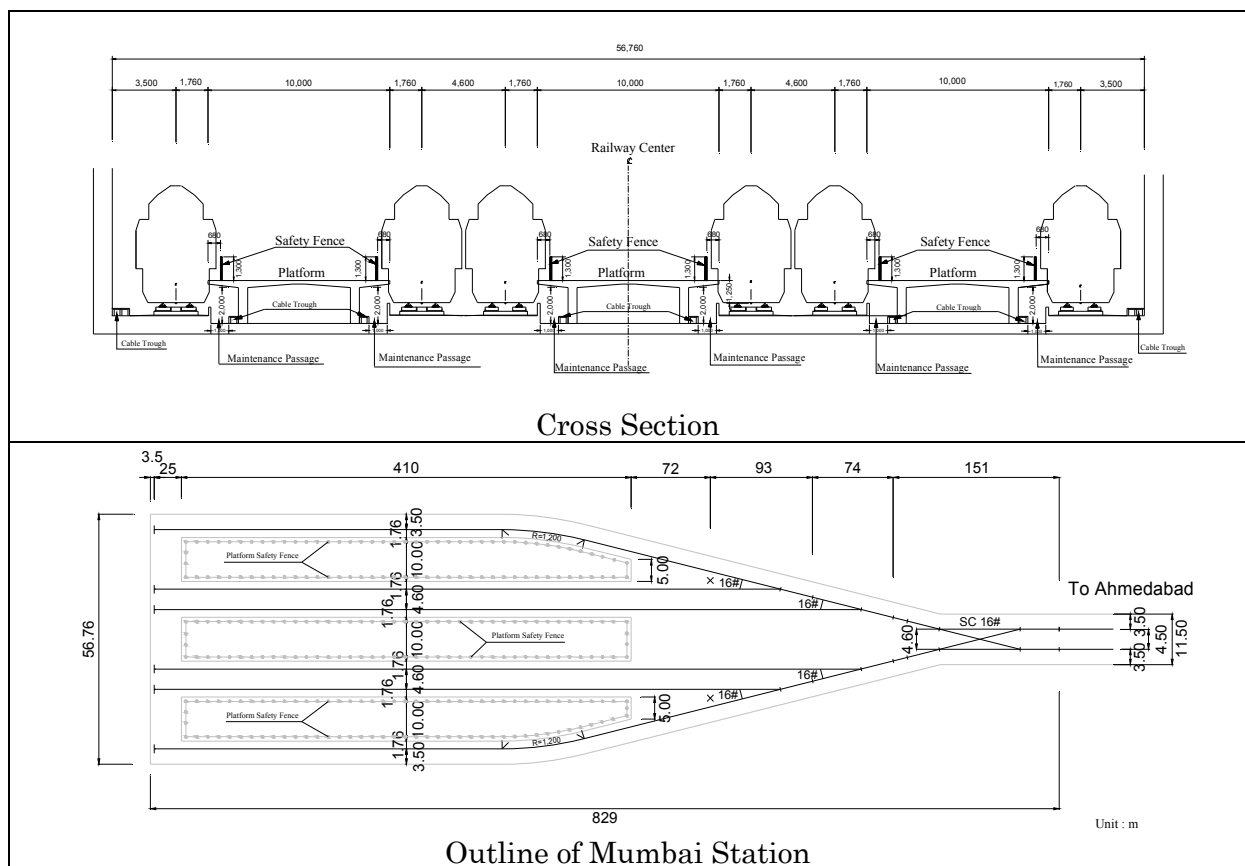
A Cross-section and a Schematic Drawing of the Track Layout, Mumbai Station
